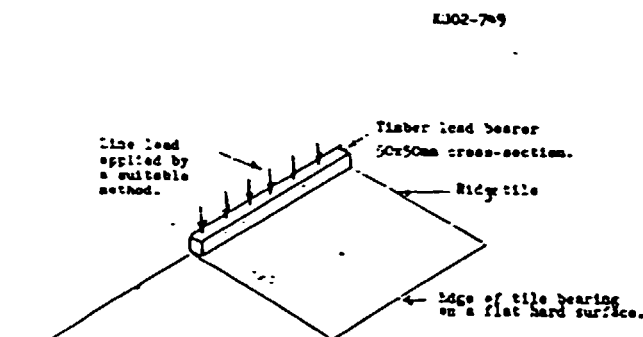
ARRANGEMENT FOR DETERMINATION OF TRANSVERSE STRENGTH OF RIDGE TILES.
